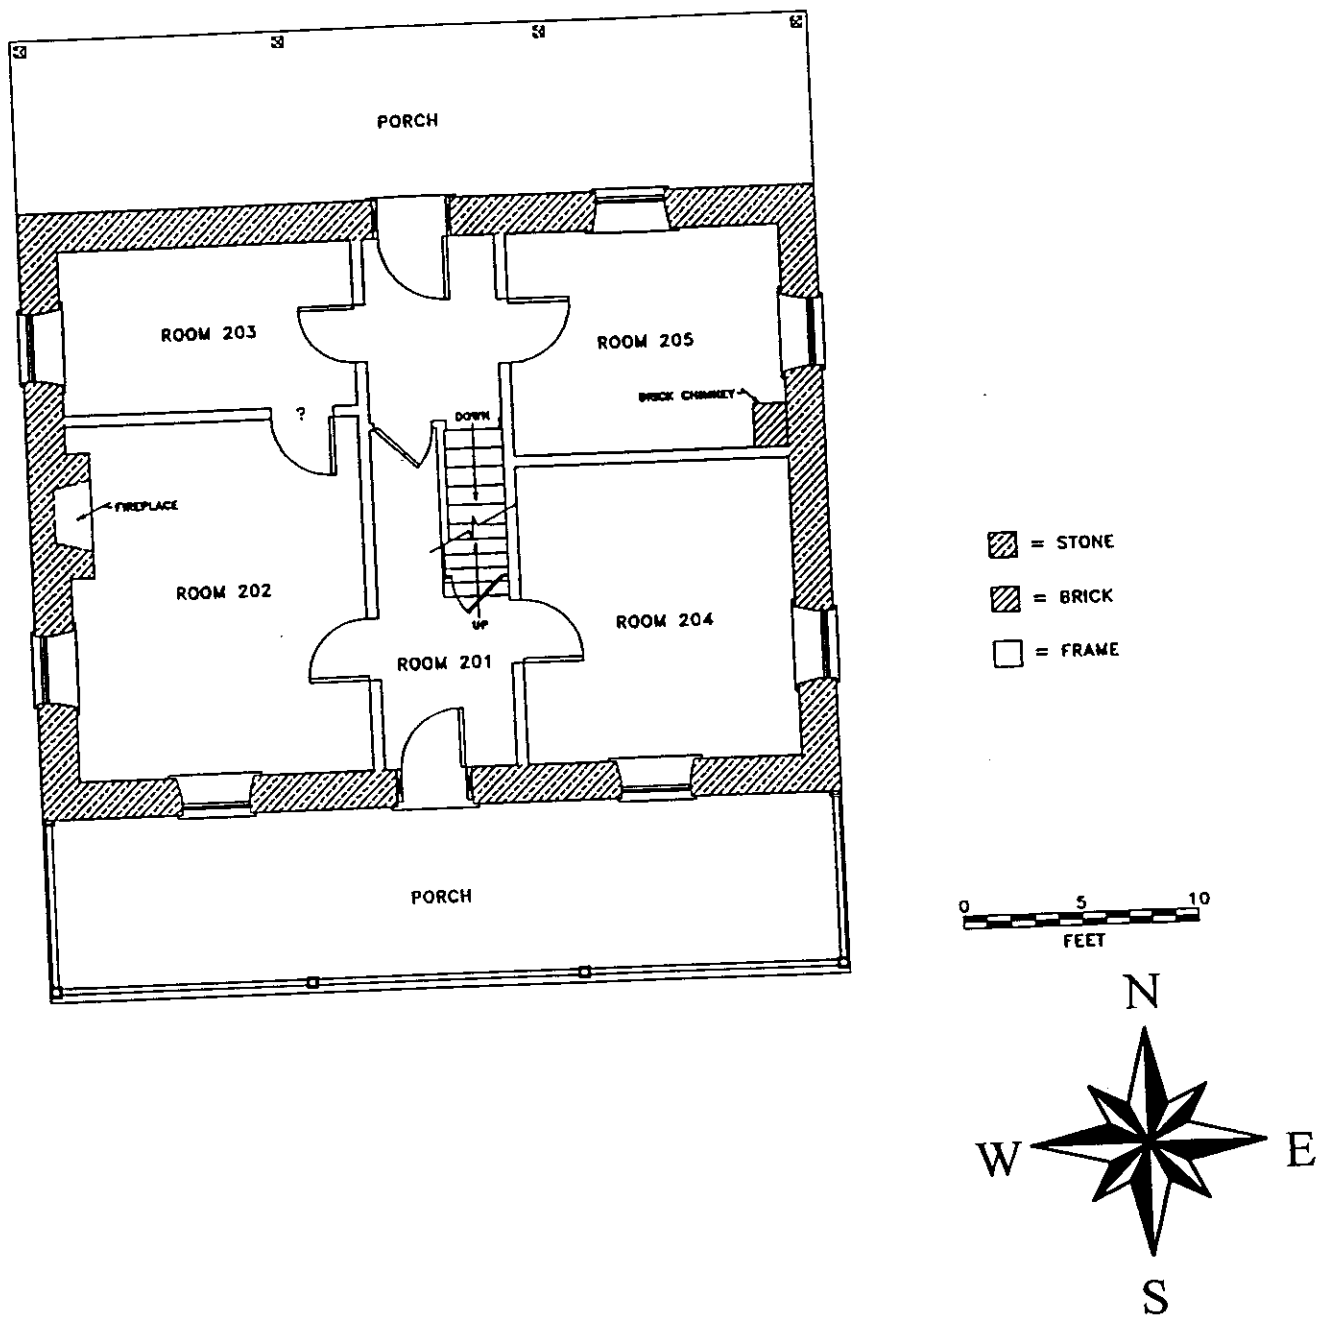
Upstairs or second-story floor plan of the Smith/Duncan House, 1876.
